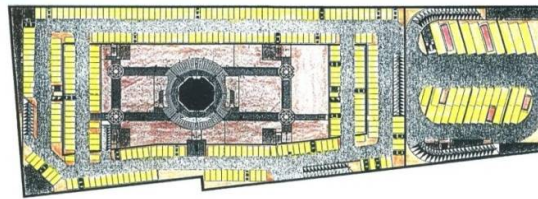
Basement floor plan (-2) of First Underground Garage under Tahrir Square.
